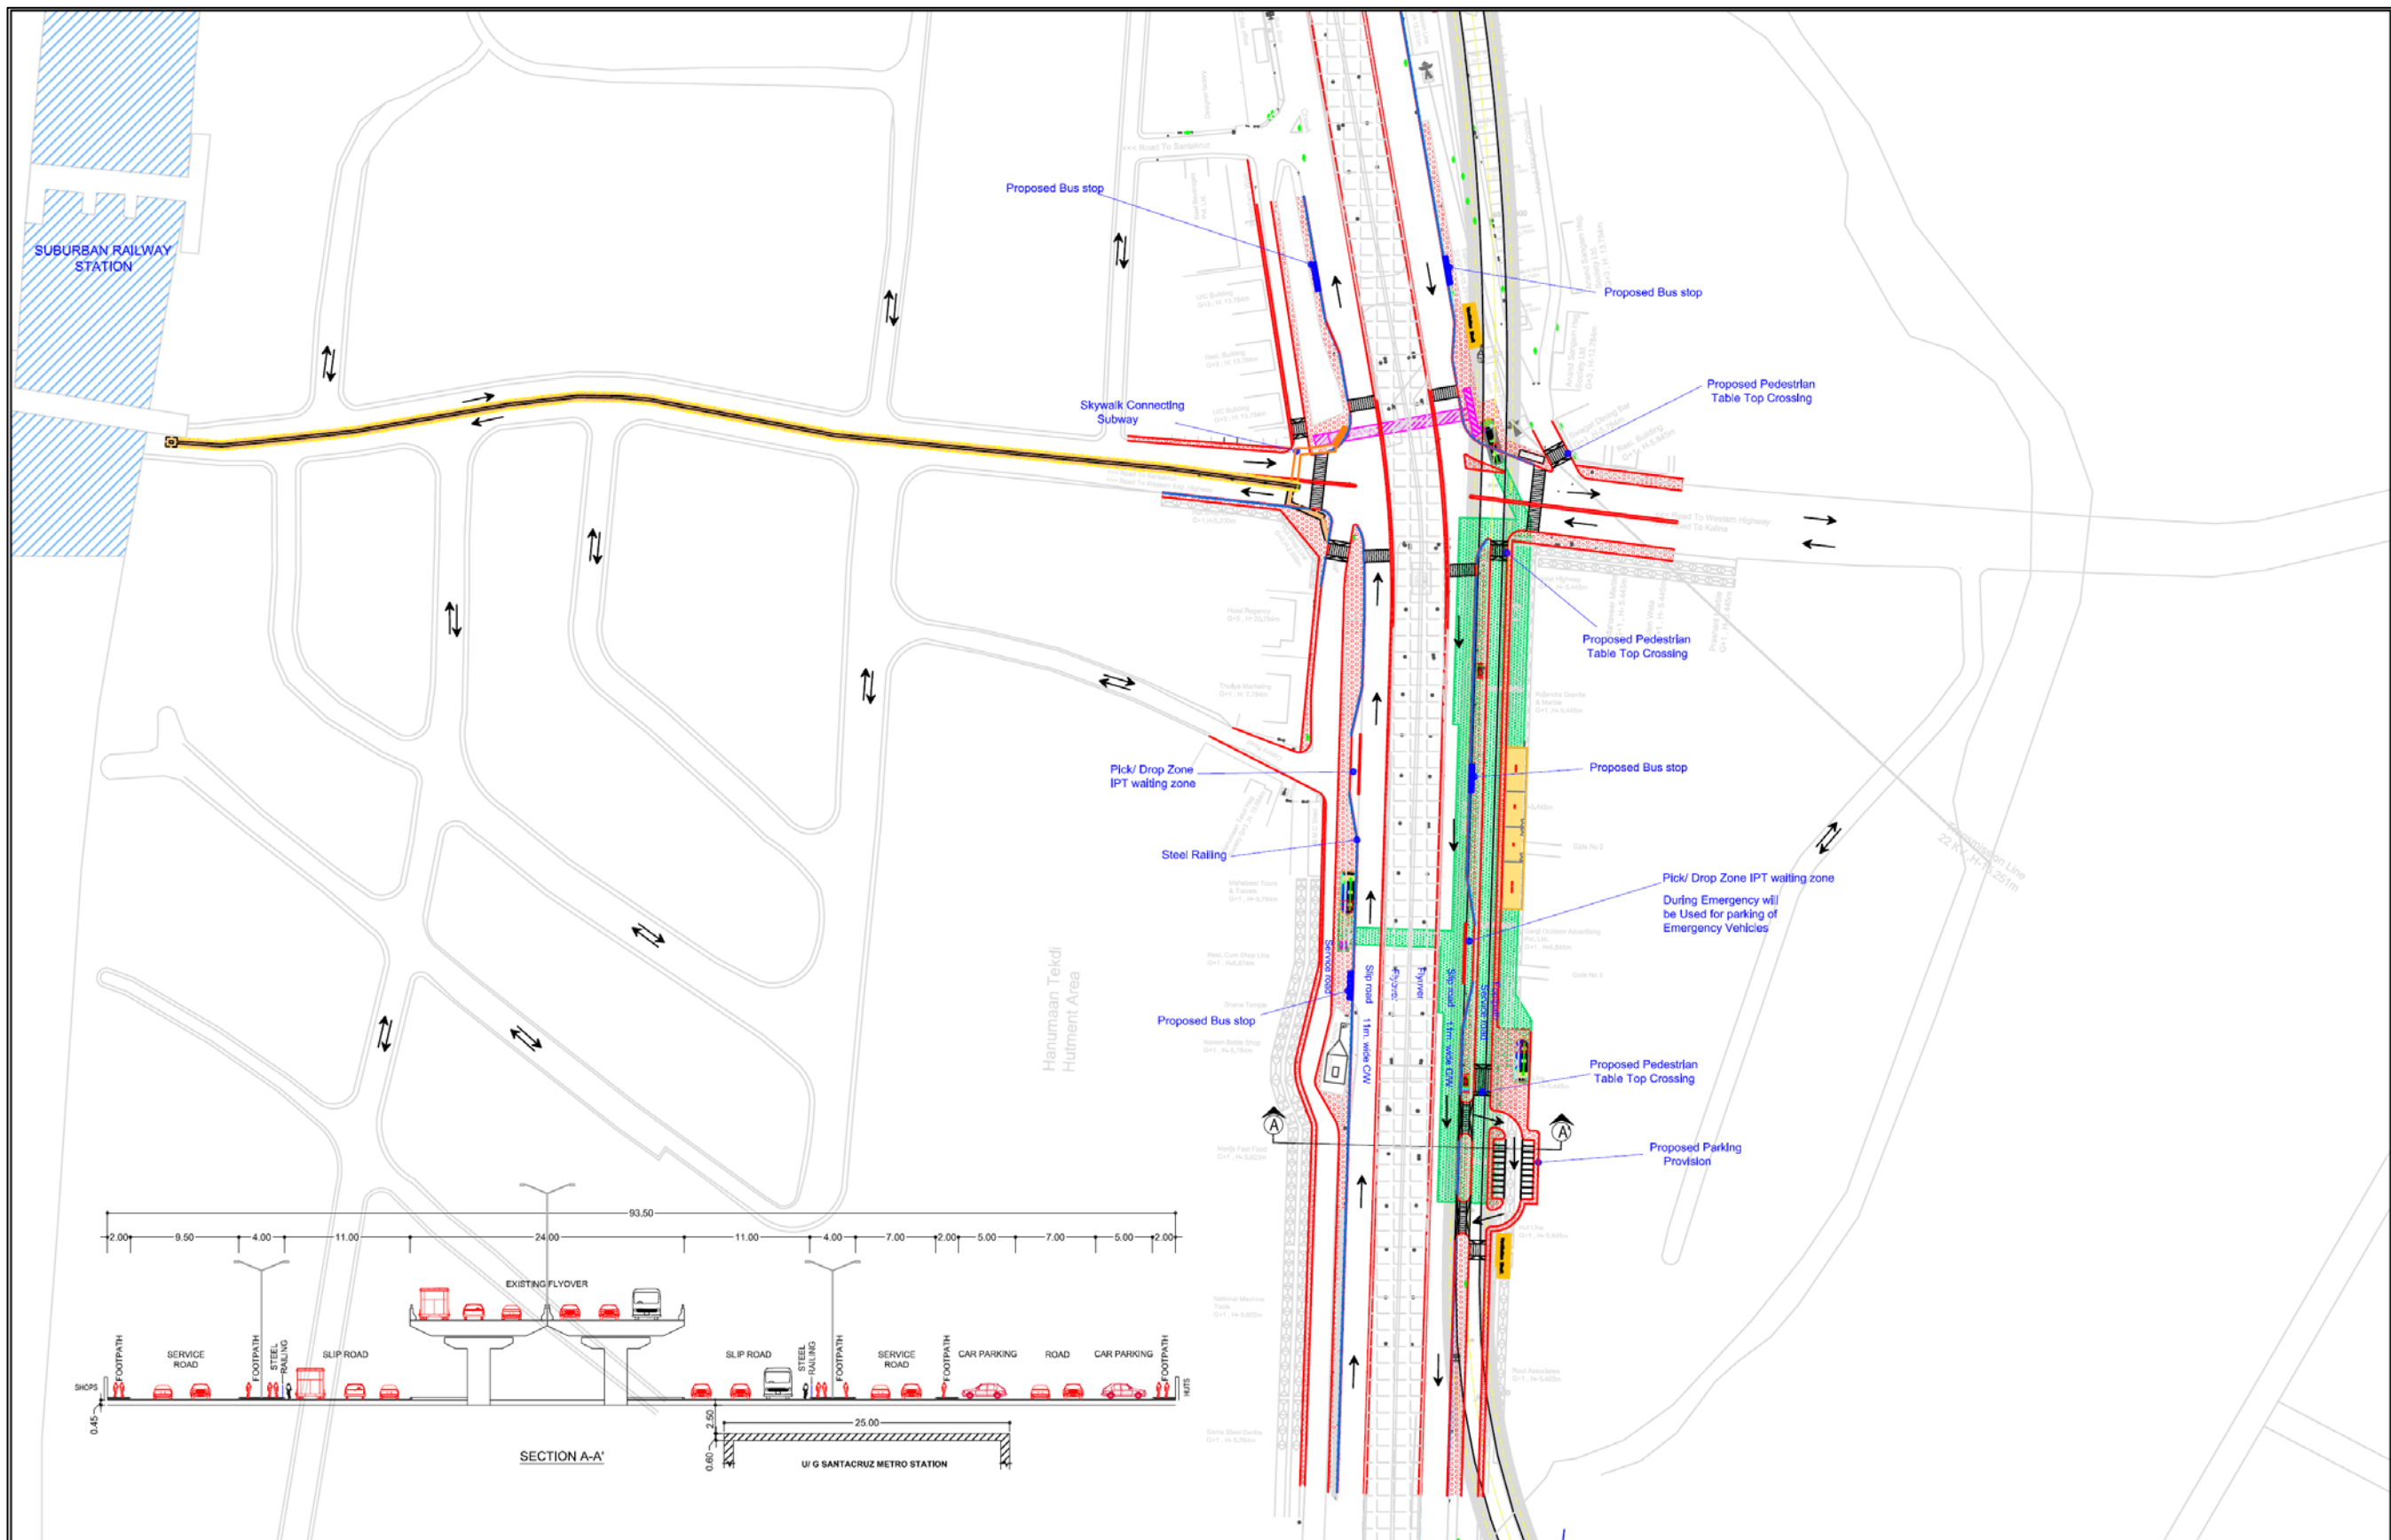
Proposed Traffic Dispersal and Circulation Plan – Bandra Metro (BKC)
